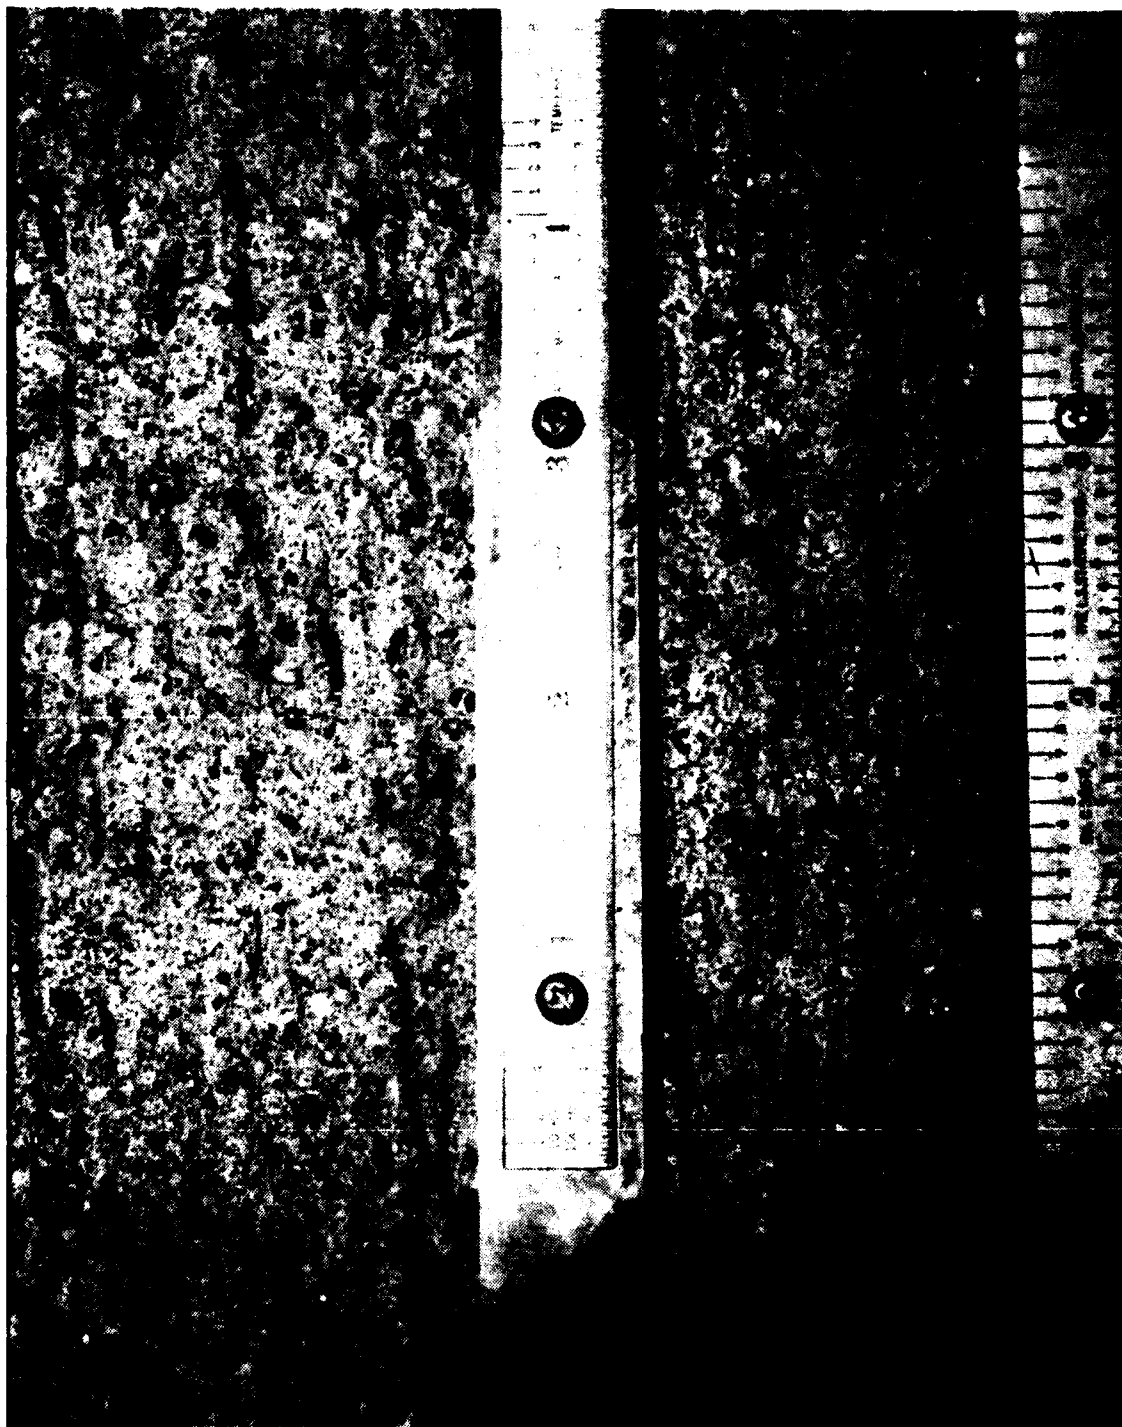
RUNWAY B, A WIRE-COMBED PORTLAND CEMENT CONCRETE
